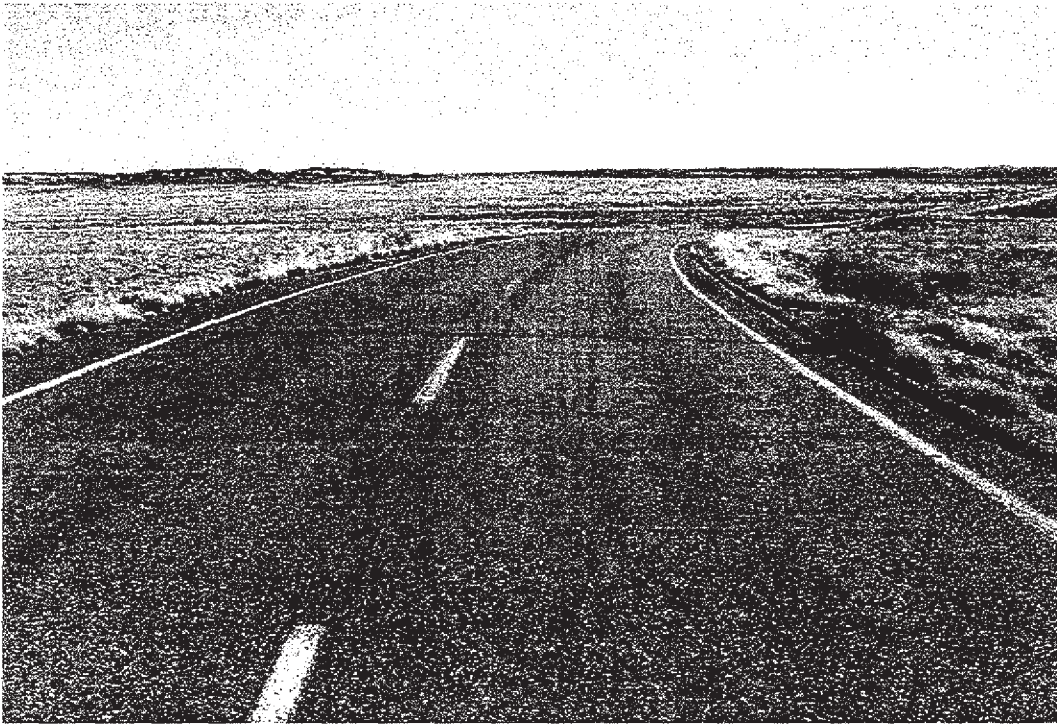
MP 19.40 - Pavement Change, Note Raveling of Chipseal
